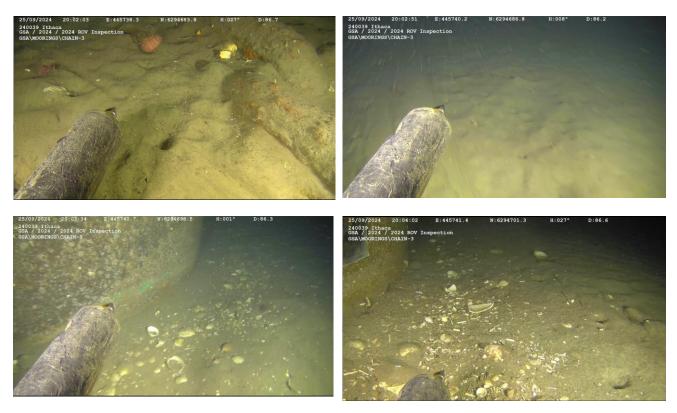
Photos of seabed around FPF-1 mooring chain 3 and anchor piles
